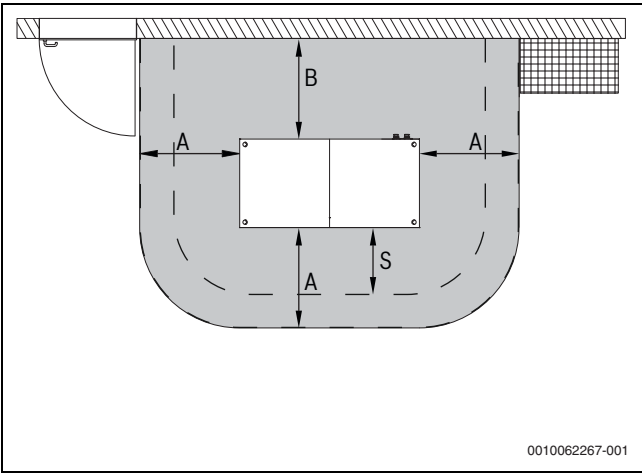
Protection zone for installation close to a wall with floor-standing installation
